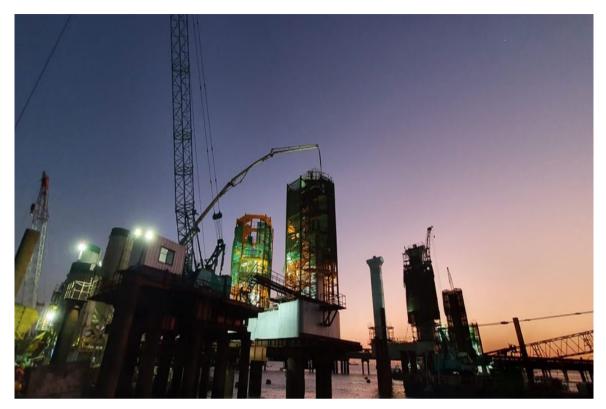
MP 84 N Pier Concrete - Marine Area
